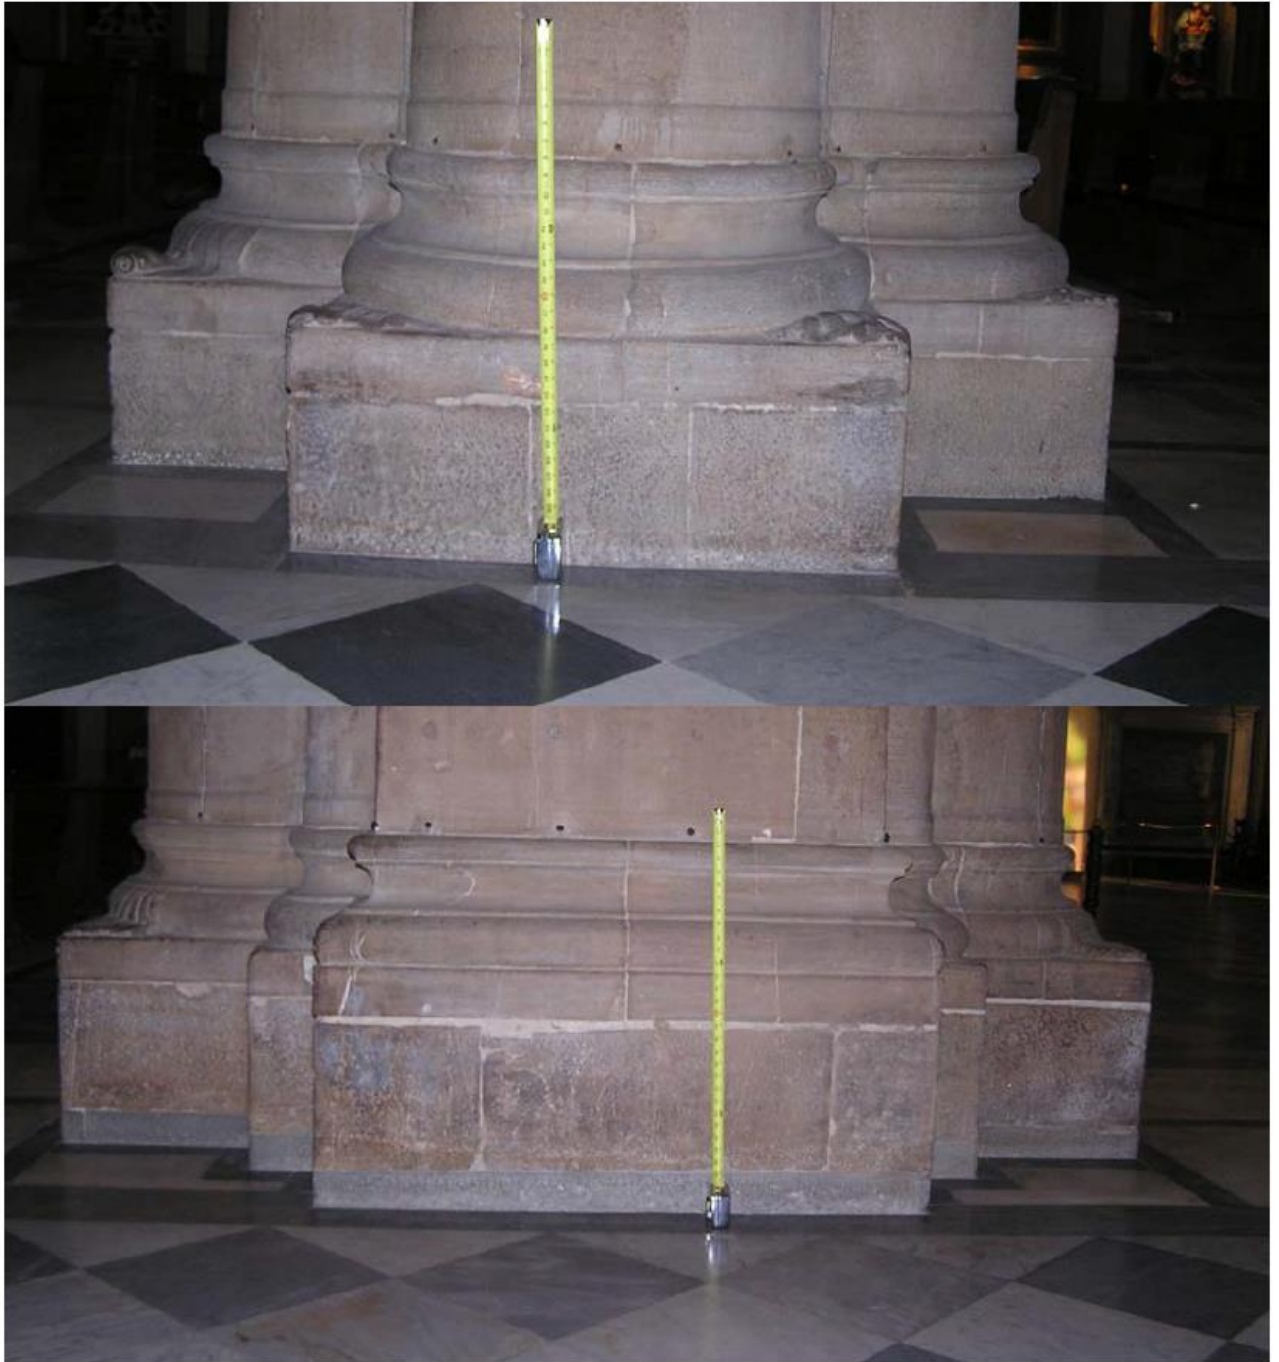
Base Group 1, light pier (2 West), and heavy pier (3 West)
